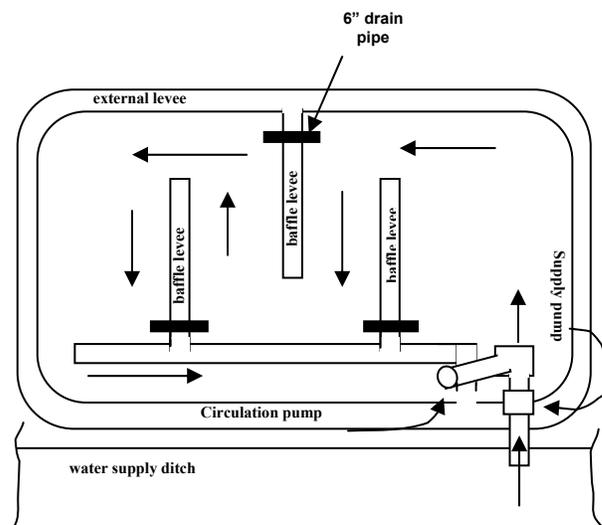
Construction plan for a crawfish pond showing a perimeter levee and baffle levees with recirculation capabilities.
